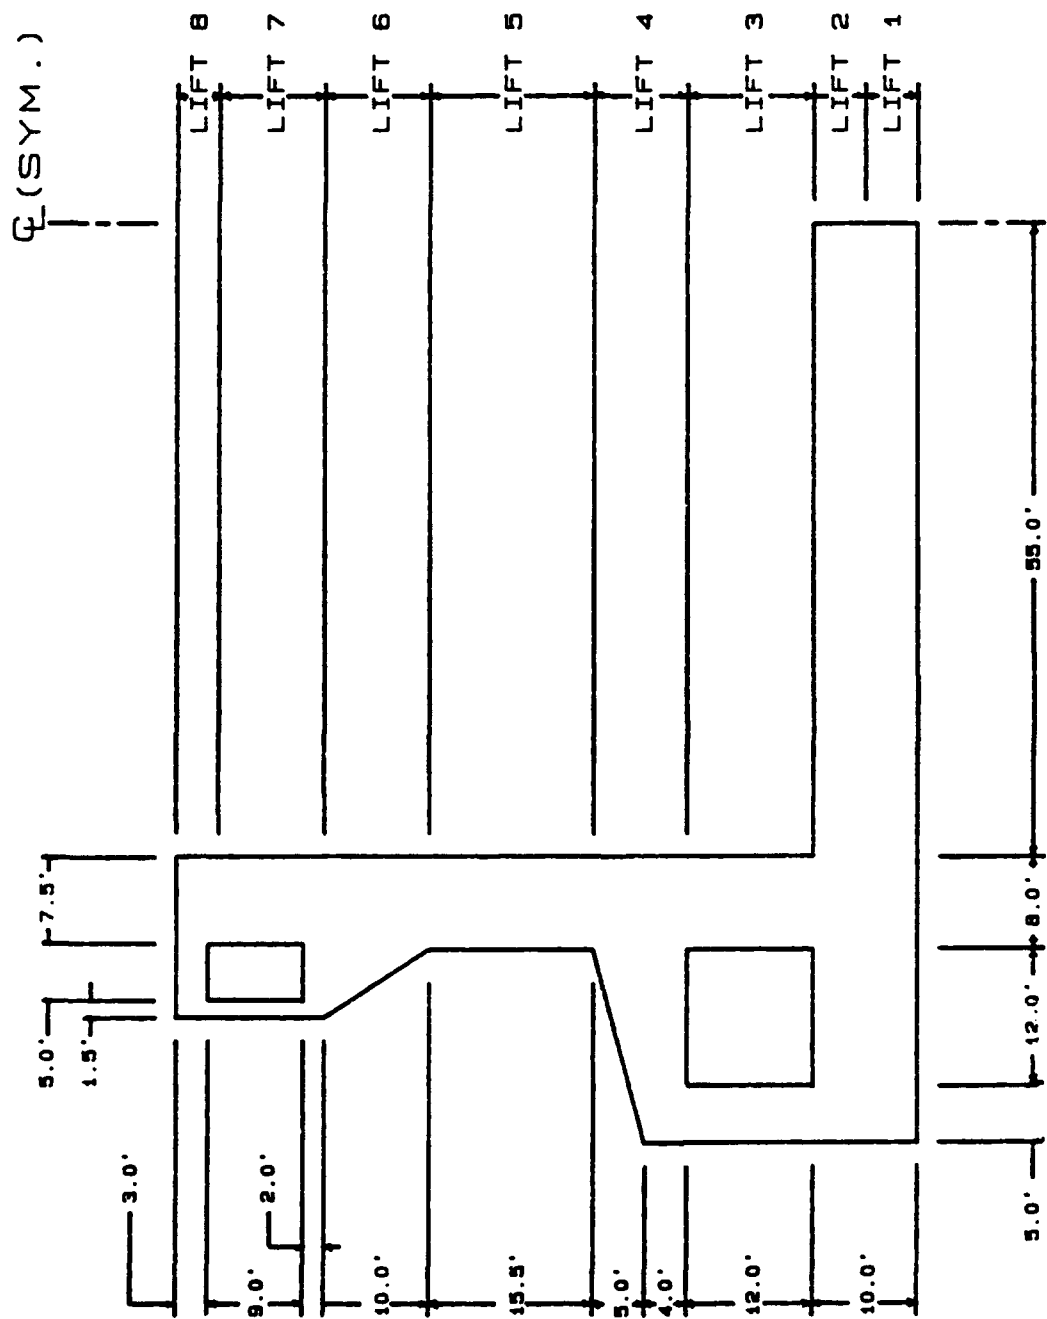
Two-dimensional view of auxiliary lock chamber for Lock & Dam 26R
